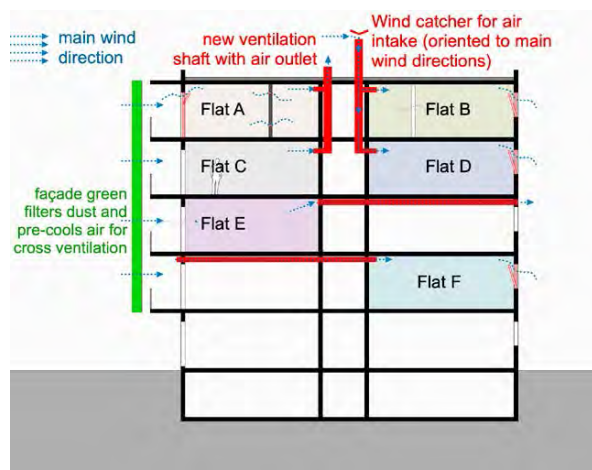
Enabling cross ventilation for apartments or offices with window orientation only to one direction (schematic section)
